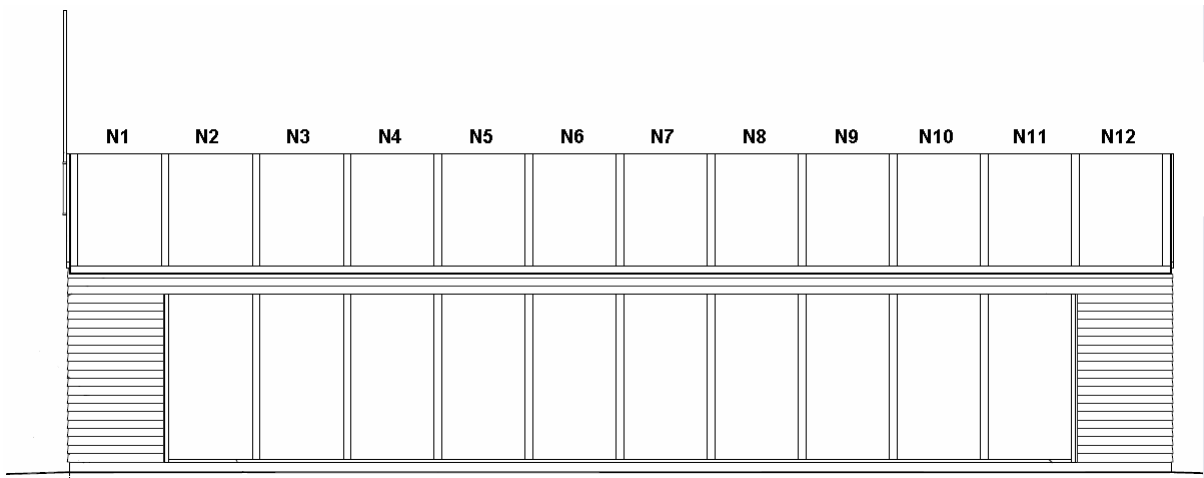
Atlanta test hut: North elevation (South similar)
